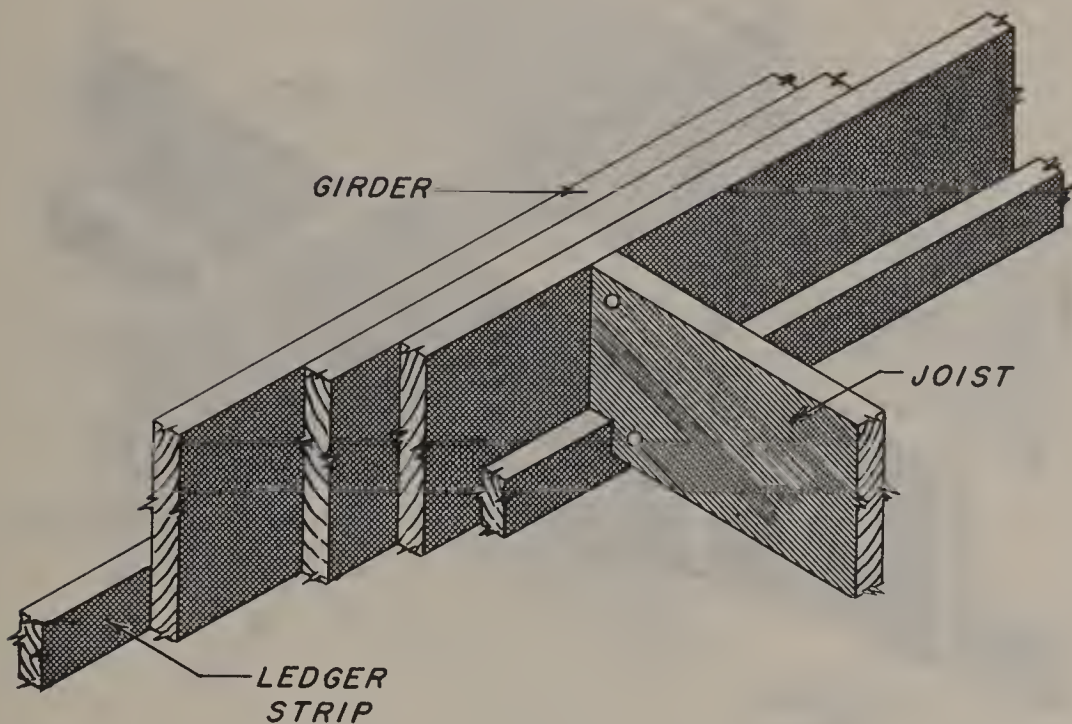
Joist notched over ledger strip. Joist toenailed to girder and to ledger strip with one tenpenny nail as shown or from opposite sides of joist. Note: Notching of joists over the member on which they bear should be avoided whenever possible.
